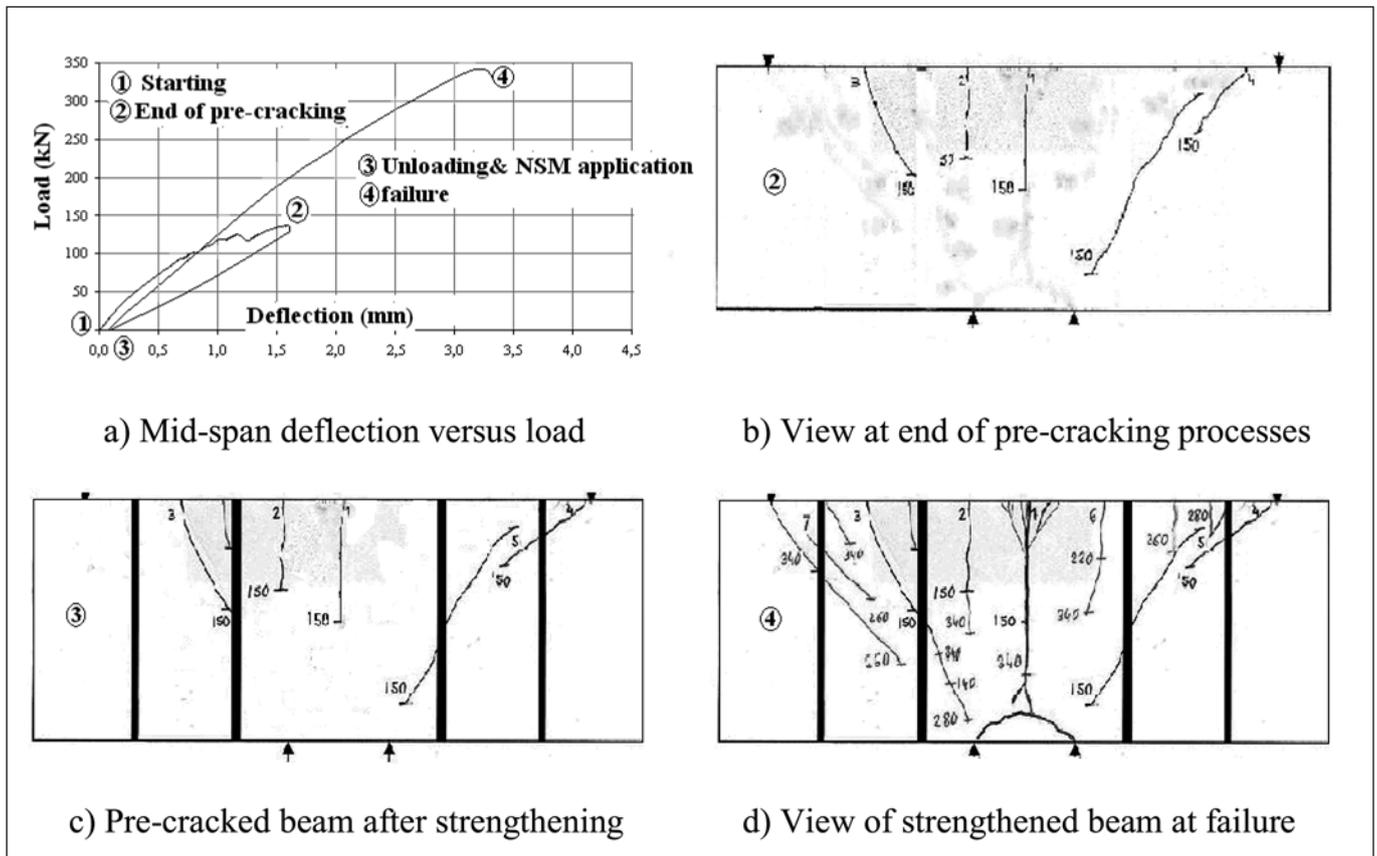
Typical observed crack patterns for pre-cracked beams strengthened with 8 CFRP strips
